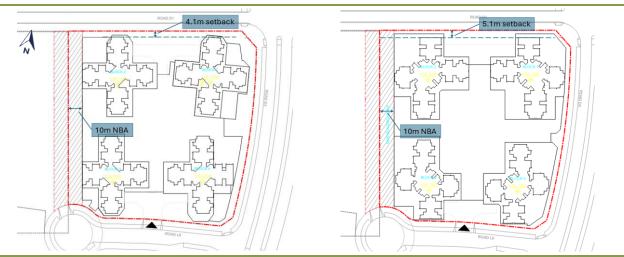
Master Layout Plan of Base Scheme (left) and Proposed Scheme (right) of Area 117
